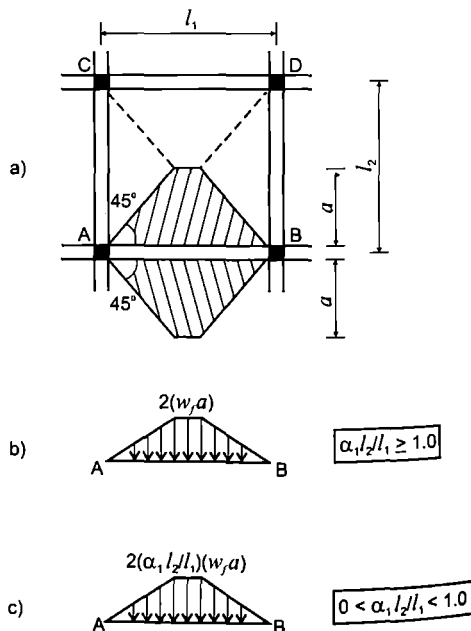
Tributary areas and loading in a two-way slab with beams: a) tributary area for an interior beam; b) beam loading when  $\alpha_1 l_2/l_1 \geq 1.0$ , and c) beam loading when  $0 < \alpha_1 l_2/l_1 < 1.0$ .
